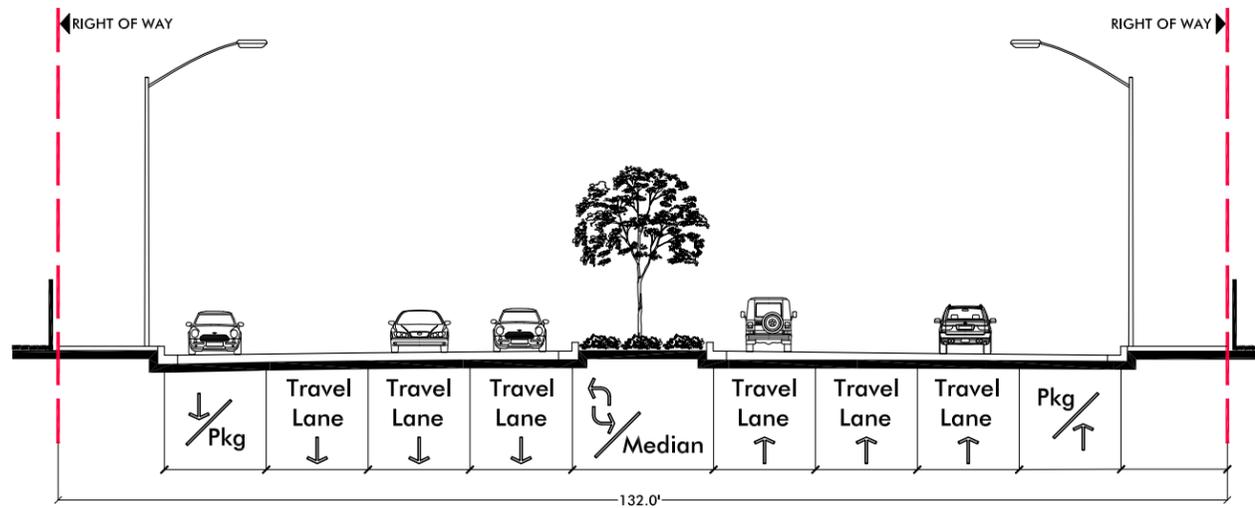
BEACH BOULEVARD EXISTING STREET DESIGN - SOUTH OF ADAMS
